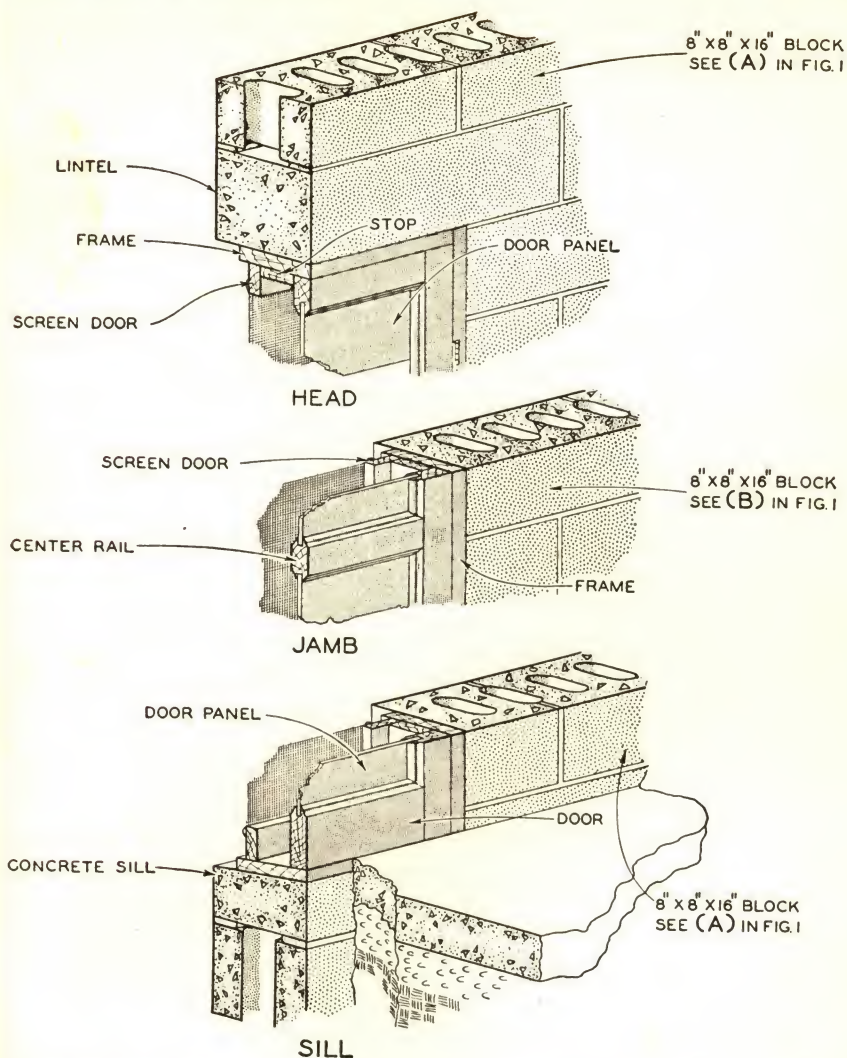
Head, Jamb, and Sill Sections of Door and Screen Door for Farm Building are attached to the jamb blocks by nails which are driven into small slats set in the mortar joints.
